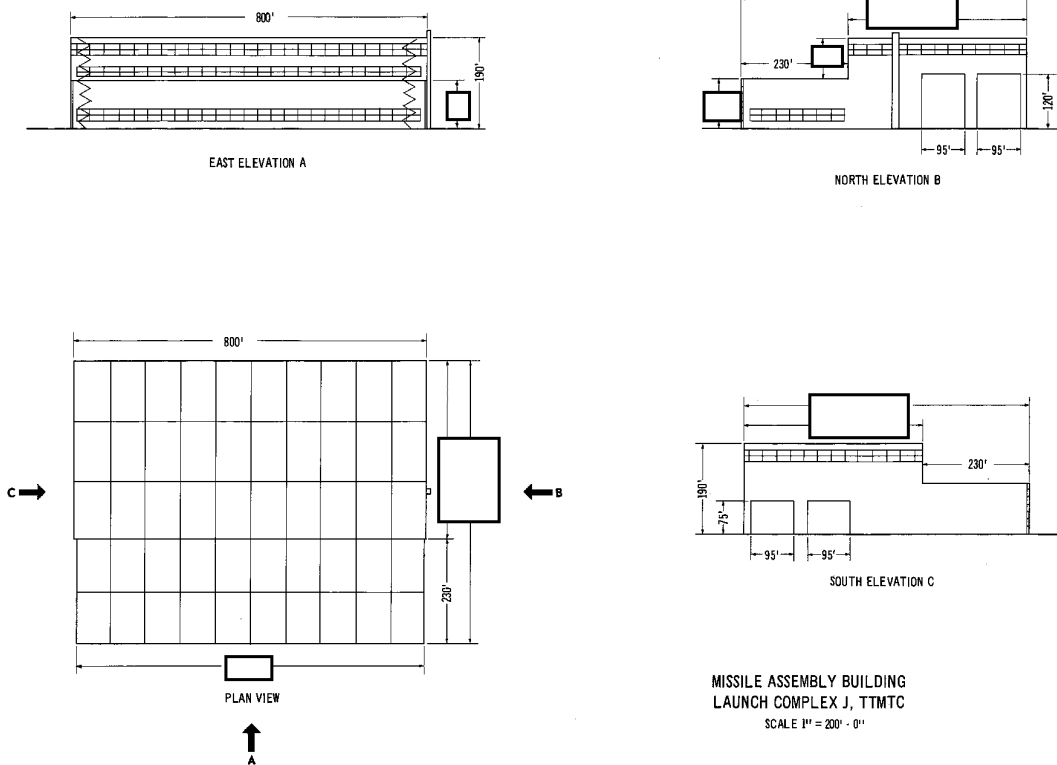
PLAN VIEW AND ELEVATION OF MISSILE ASSEMBLY BUILDING, LAUNCH COMPLEX J.
